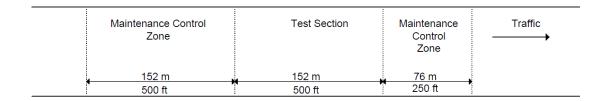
Typical layout of an LTPP test section (Adapted from Elkins et al. 2003)
